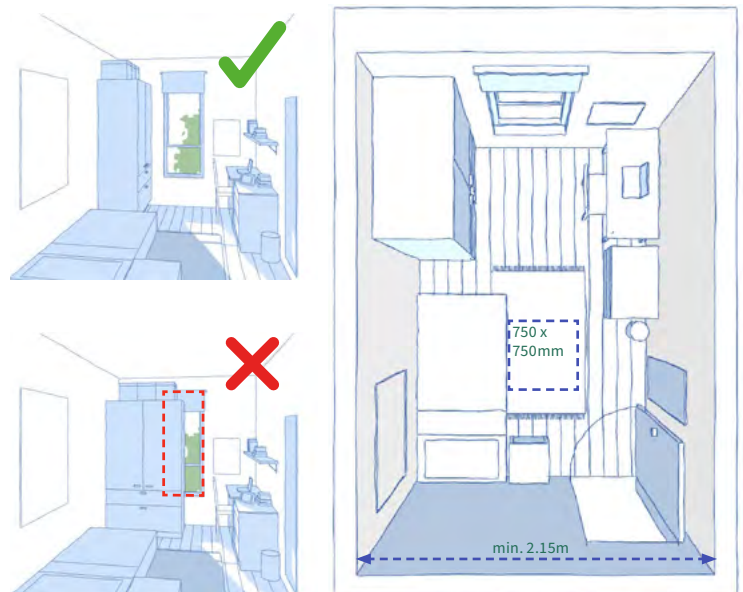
Example single bed bedroom Furniture should be shown on floor plans to illustrate how a room functions appropriately without compromising its use. Furniture should not block windows or access routes - more details can be found in Approved Document Part M. Plans must be flexible enough to accommodate furniture from the Part M Appendix D: Furniture schedule. Room dimensions must meet minimum requirements set out in the Draft Good Quality Housing SPG found in Module C.
